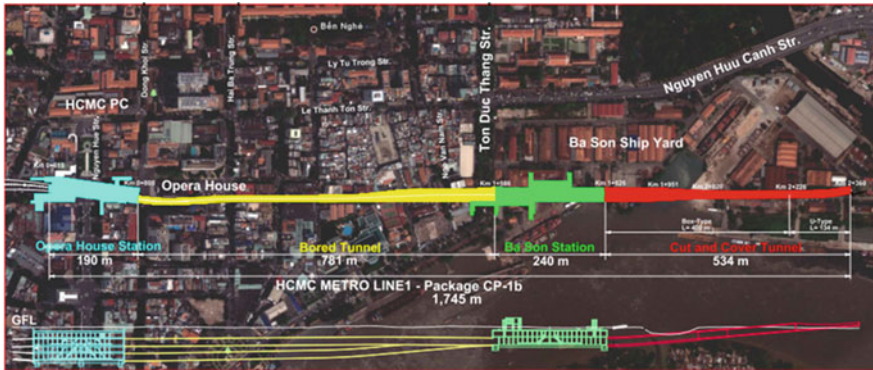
Underground section between Bason station and Opera House station, Ho Chi Minh City metro line 1
